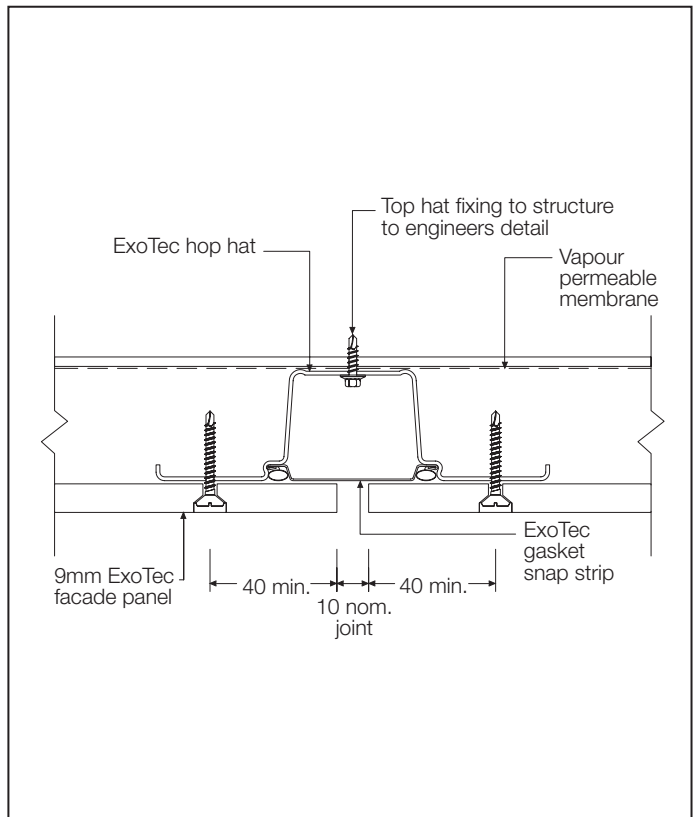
VERTICAL PANEL JOINT DETAIL
